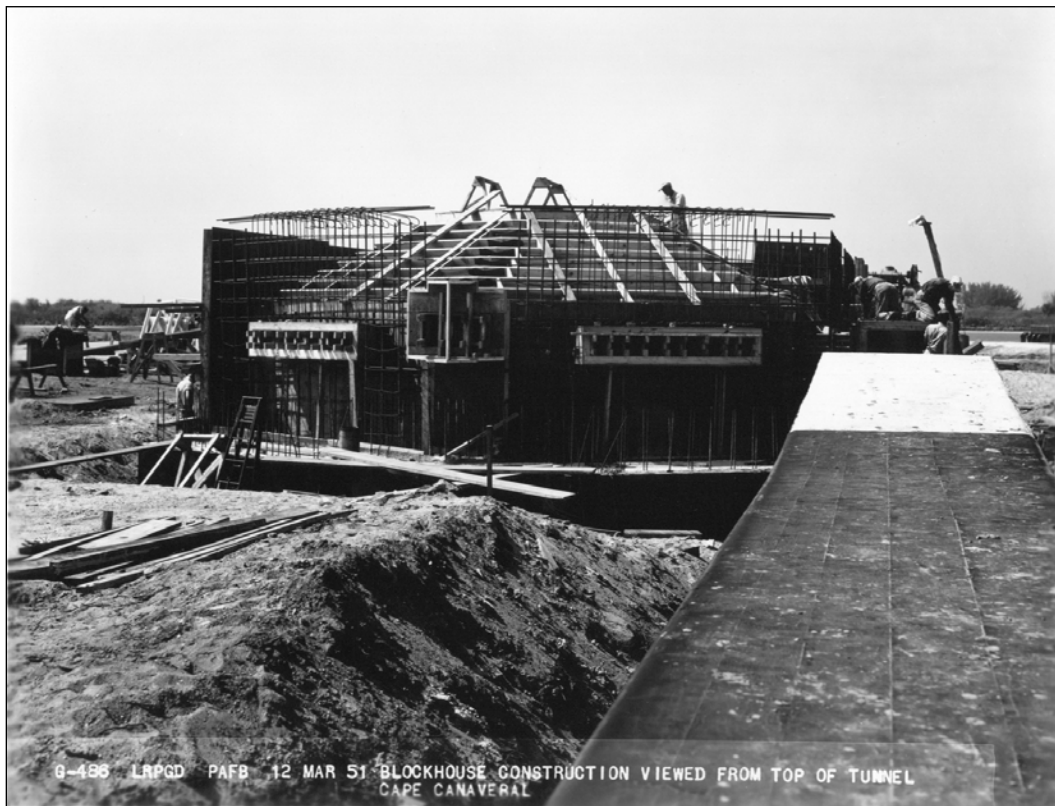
Launch Complex 3/4 Blockhouse construction viewed from top of Tunnel, March 12, 1951.
